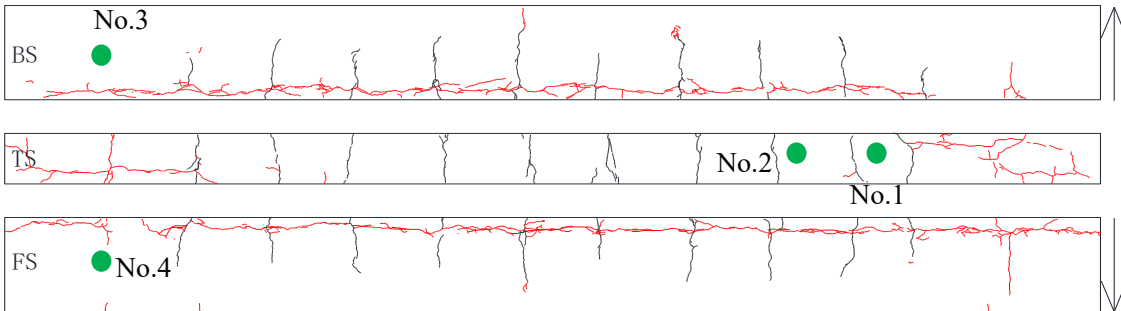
Cracking situation on C4 beam at 48 months
